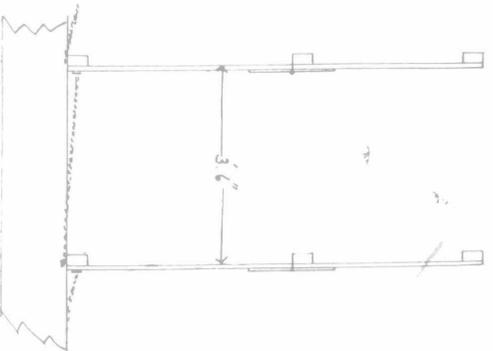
Ground-floor plan of Mr. Wells' cow stall.
